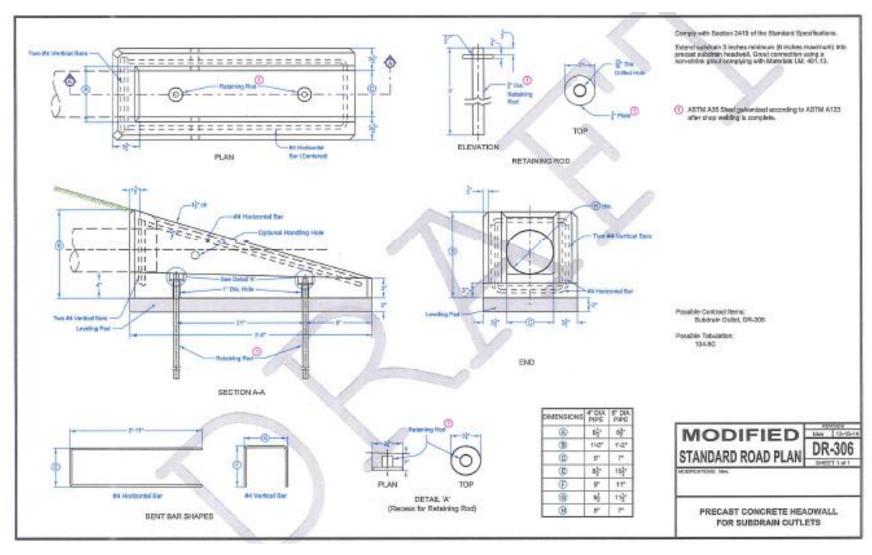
Draft precast concrete headwall specification adopted by Iowa DOT for subdrain outlets
